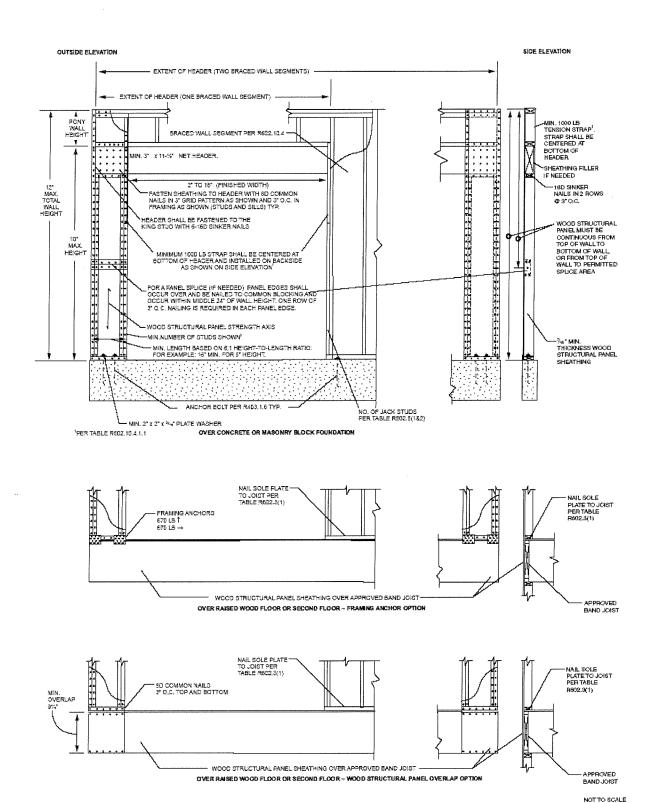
METHOD CS-PF: CONTINUOUS PORTAL FRAME PANEL CONSTRUCTION
